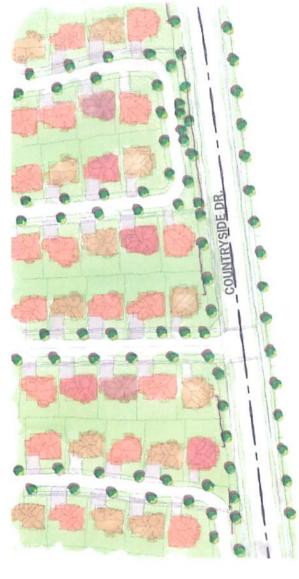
CONCEPT PLAN AREA 4: COUNTRYSIDE DRIVE EXECUTIVE STREETSCAPE
